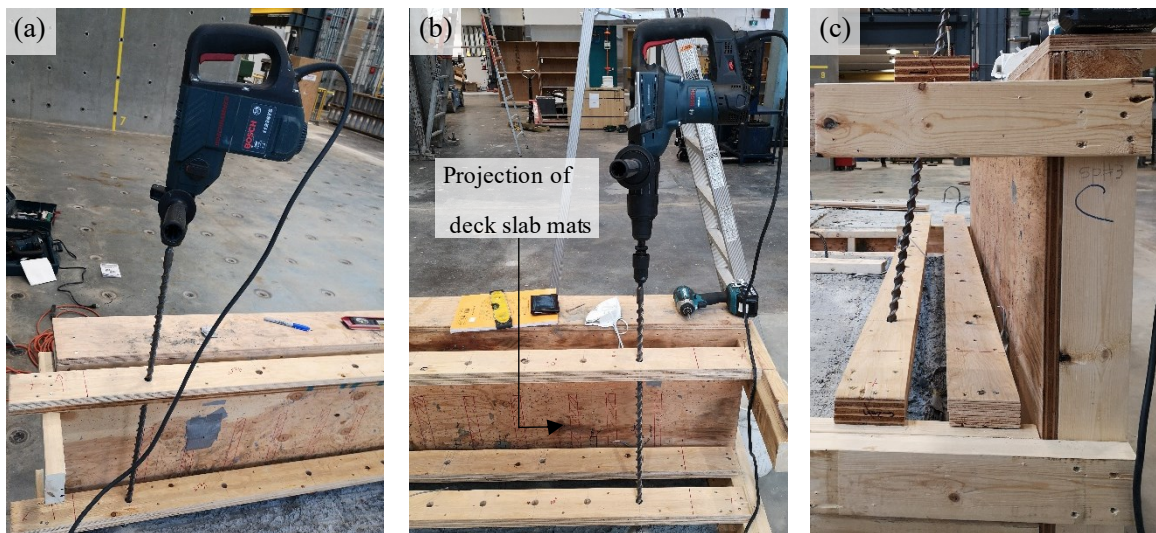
Drilling guides for (a) for back rebar assembly, (b) front rebar assembly. (c) Shows lateral view of front drilling guide where inclination is observed.
